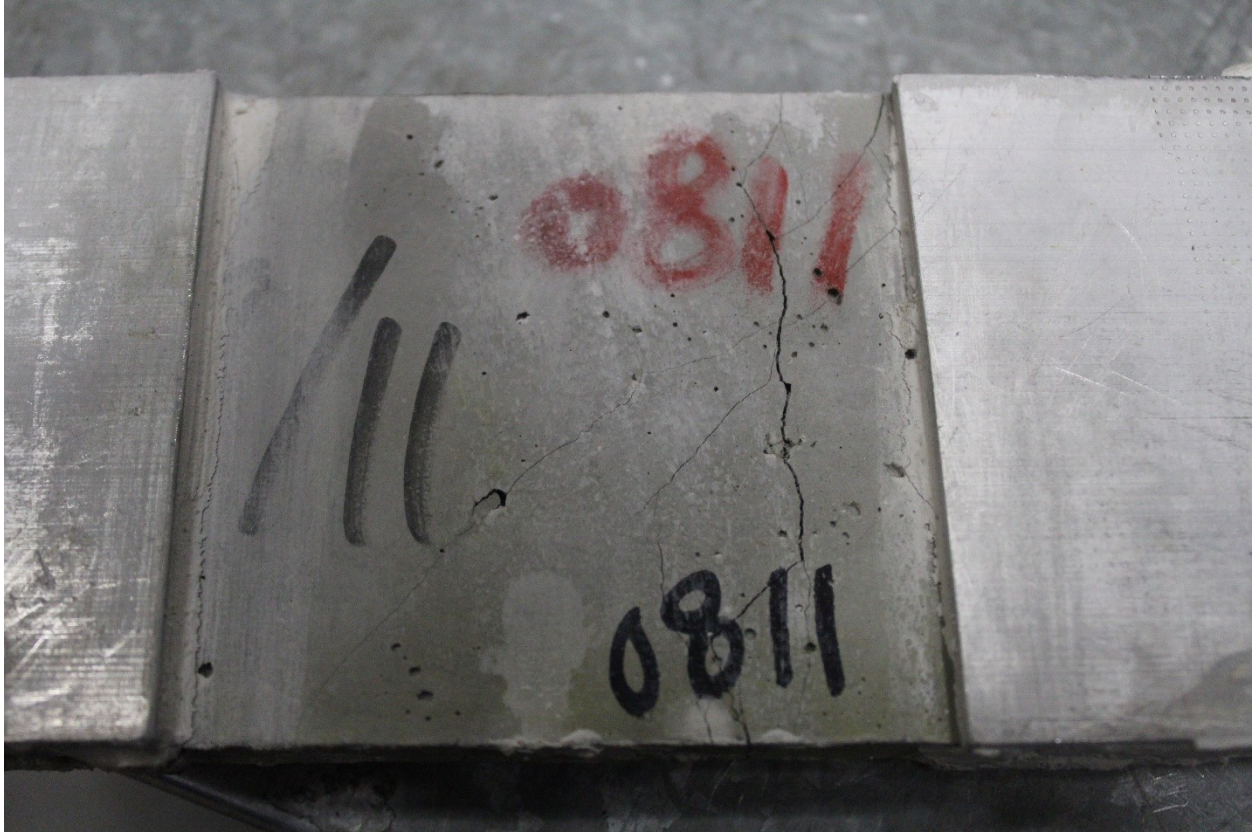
Tensile cracking on ECC05 coupon specimen
